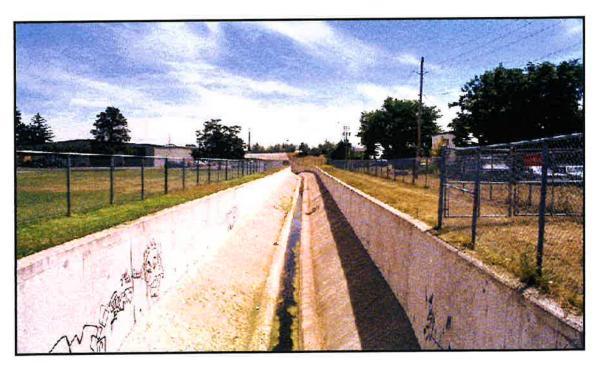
Looking downstream from atop the Plains Road culvert towards Fairview Street.
